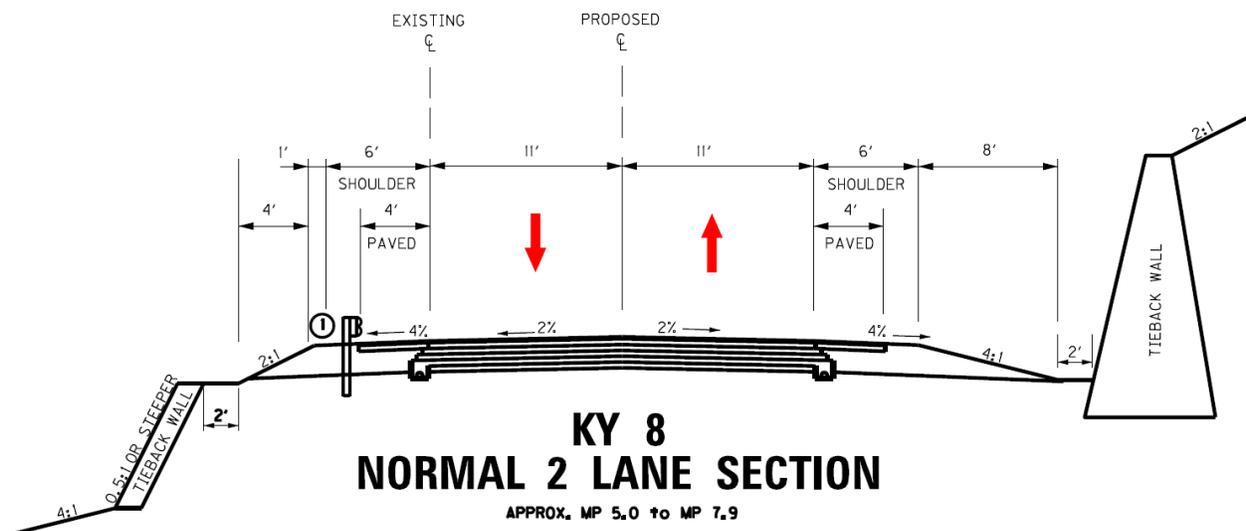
Conceptual Typical Section – Alignment Shift and Slope Stabilization from KY 8 MP 5.0 to MP 7.9 (Alternative 2)
